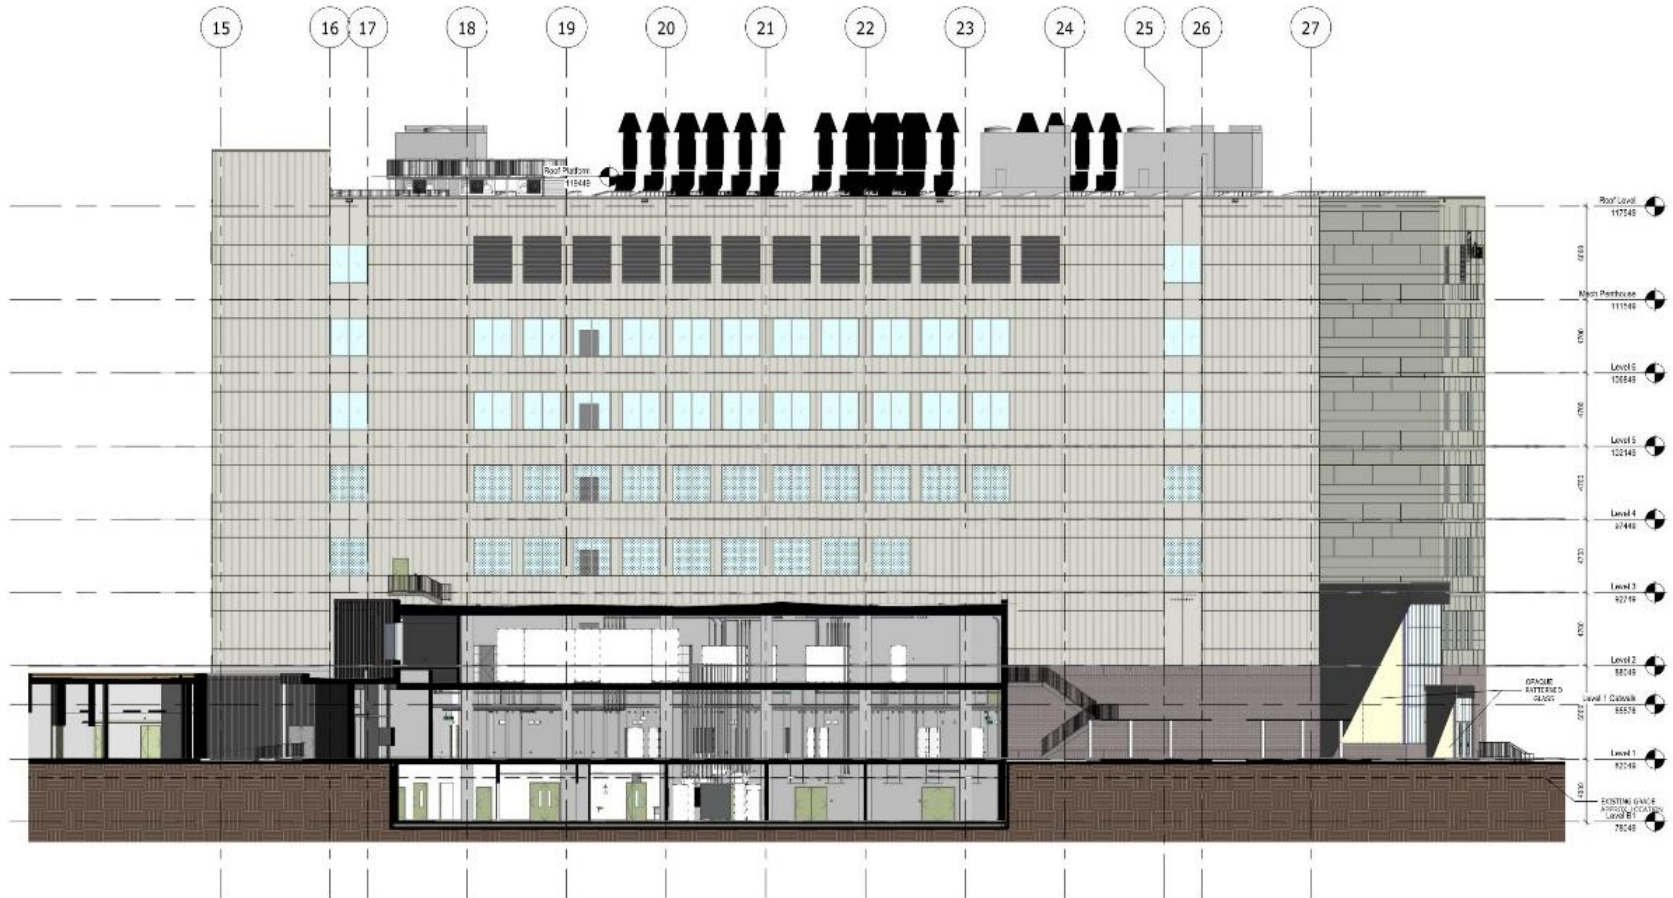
Proposed Building Elevations (North) - 451 Smyth Road (Prepared by Parkin Architects Limited, dated April 18, 2024)
